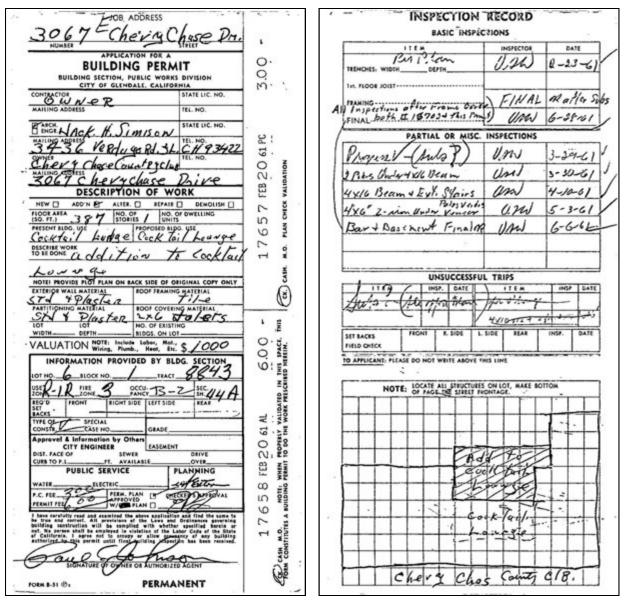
3067 E. Chevy Chase Drive, cocktail lounge addition building permit, no. 17658, 1961 (Glendale Community Planning Dept)
